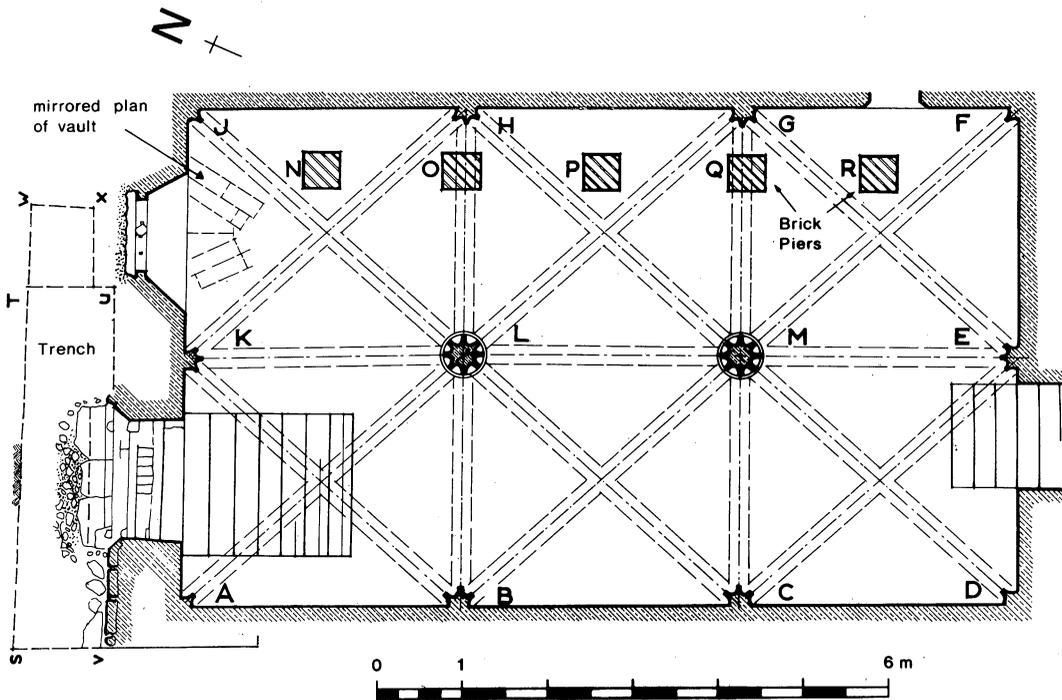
72/74 High Street, Guildford, Plan of Undercroft and Contractors' (Caesar Bros) Foundation Trench.
